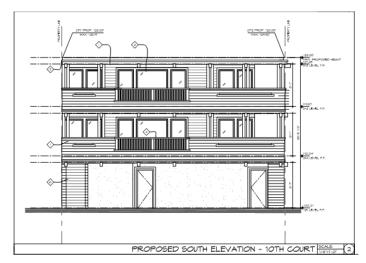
Proposed south façade of new building facing 10th Court alley. Source: A3.10, Peha & Associates Architecture, December 21, 2017.
